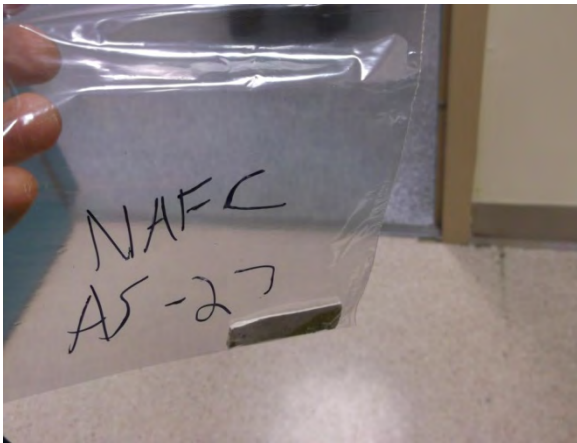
View of vinyl sheet flooring and mastic sample AS-27.
